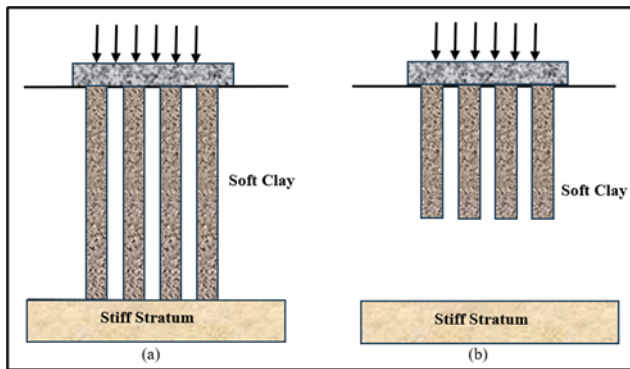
Types of stone columns (a) End bearing stone columns, (b) Floating stone columns.
